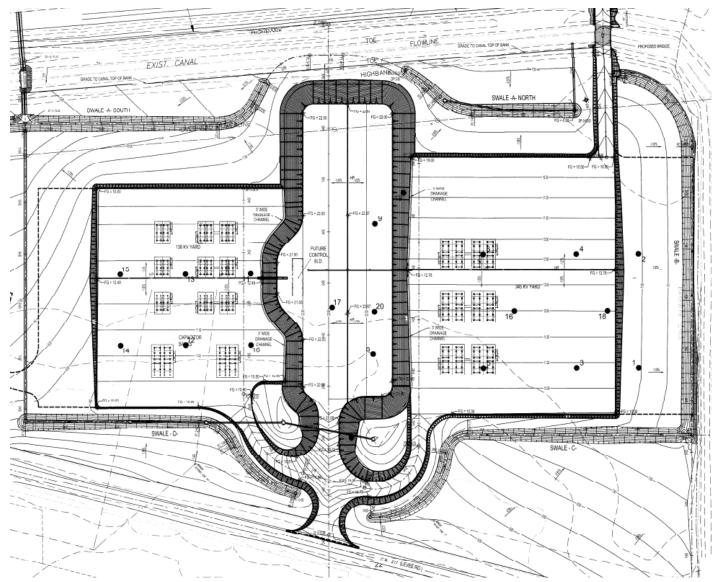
Final grading plan for Jones Creek Substation fill project.
